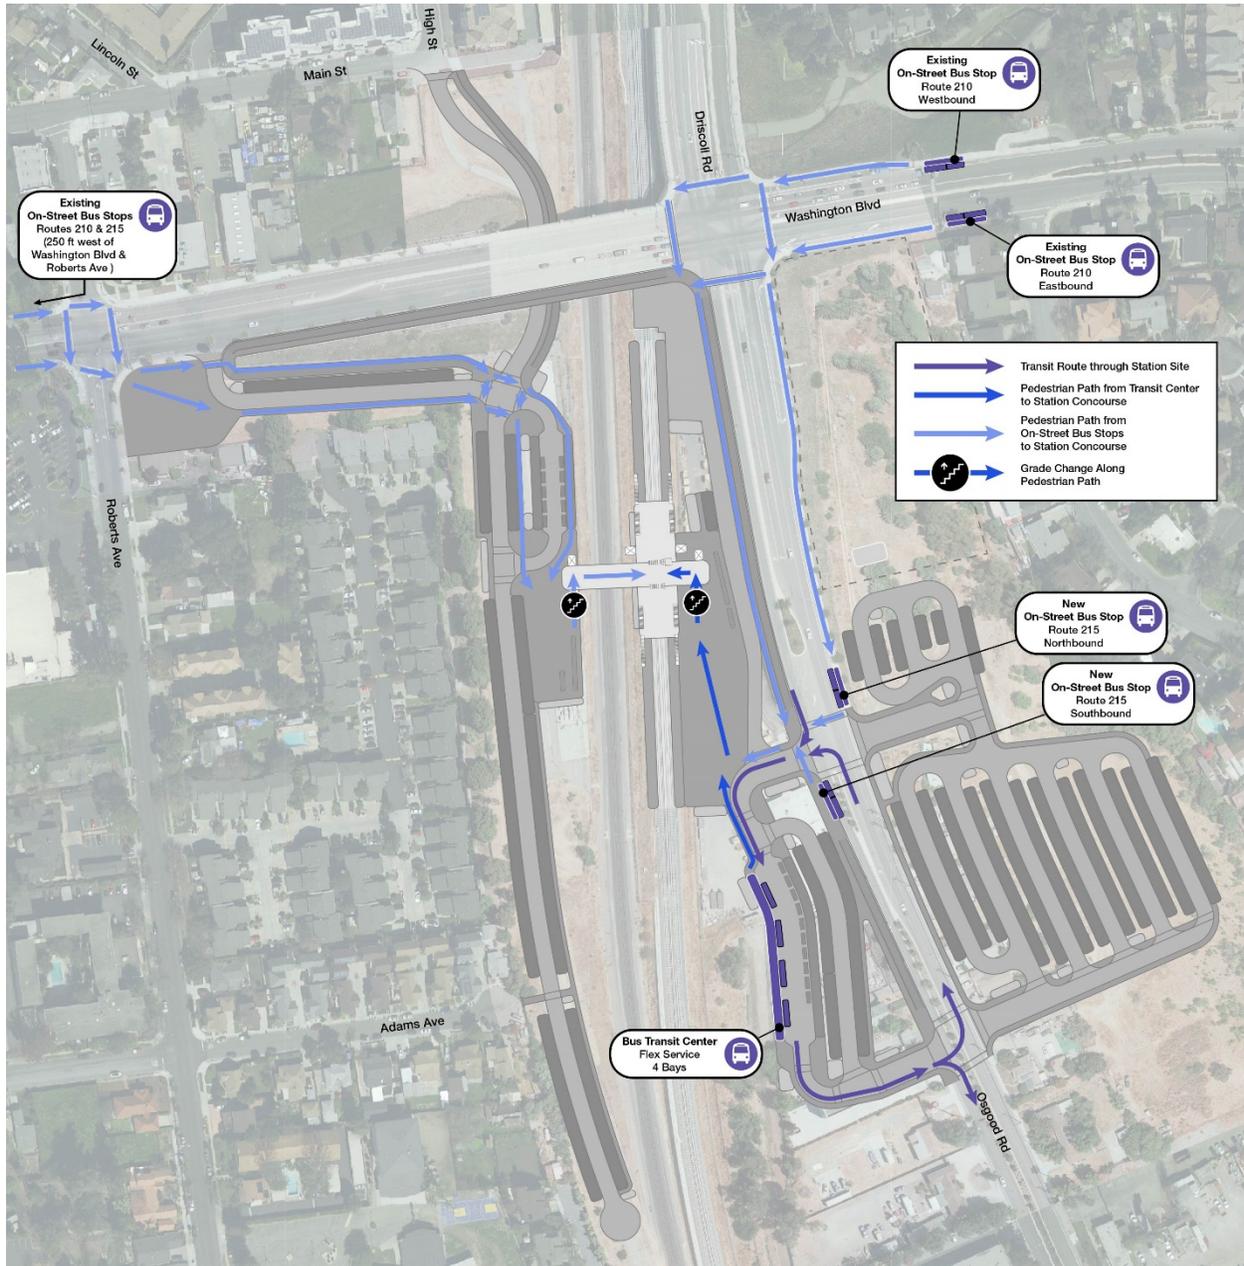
Station Site Transit Access Points and Paths- Alternative C
